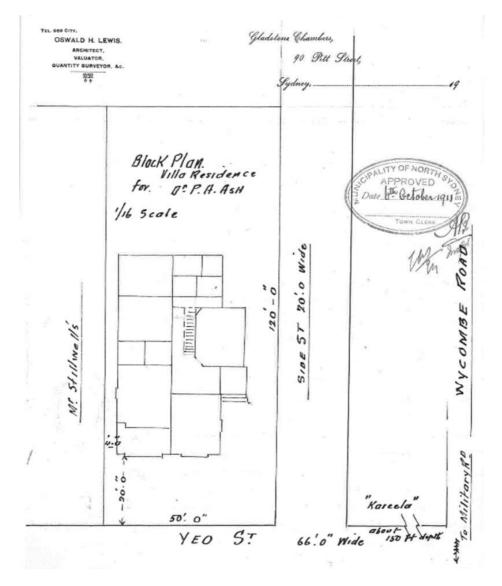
Block Plan for Villa Residence for Dr P. A. Ash', by Oswald H. Lewis, architect, valuator and quantity surveyor, showing the footprint and details of the internal layout of the building. The plan is part of building application 11/742, approved by Council on 6 October 1911 (Source: Stanton Heritage Centre, North Sydney, Building Application files, BA 11/742).
